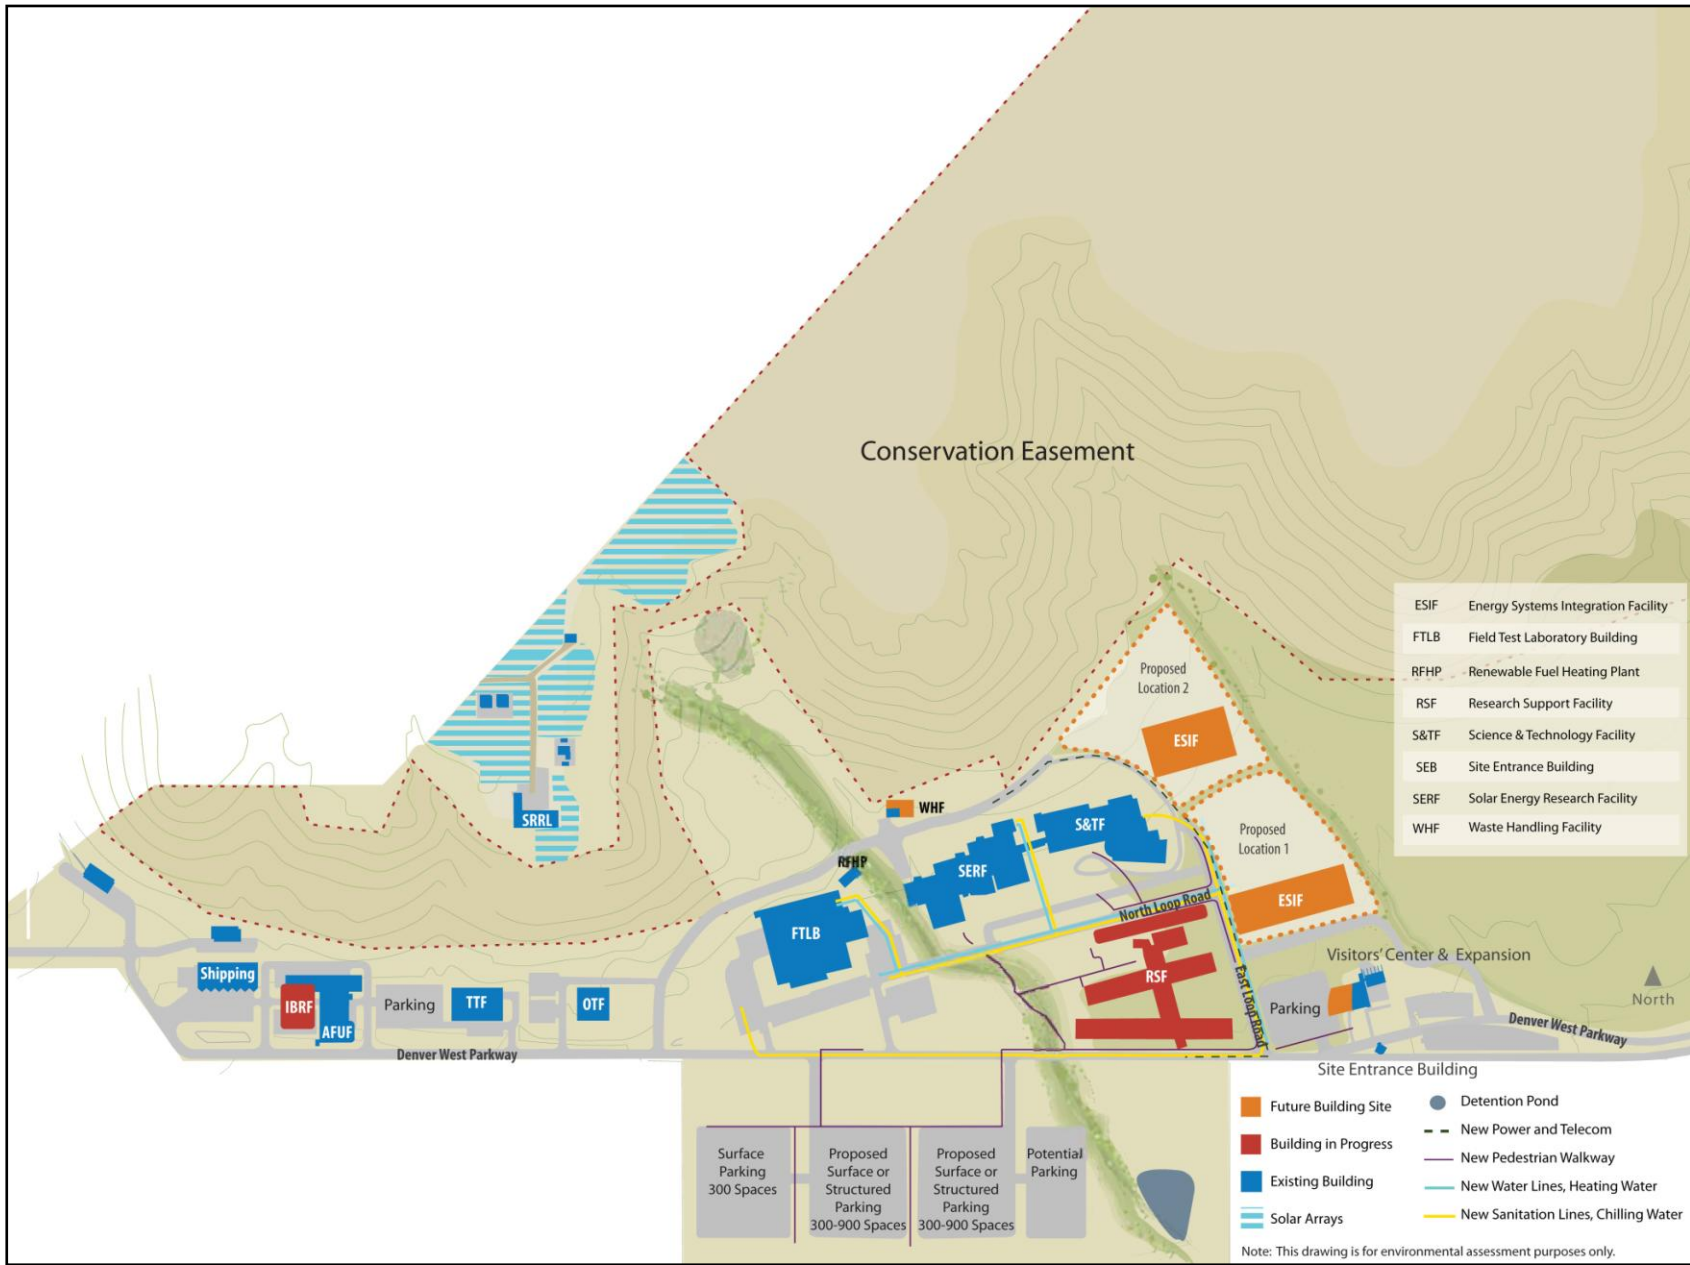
On-site Locations of Proposed Buildings and Upgrades
